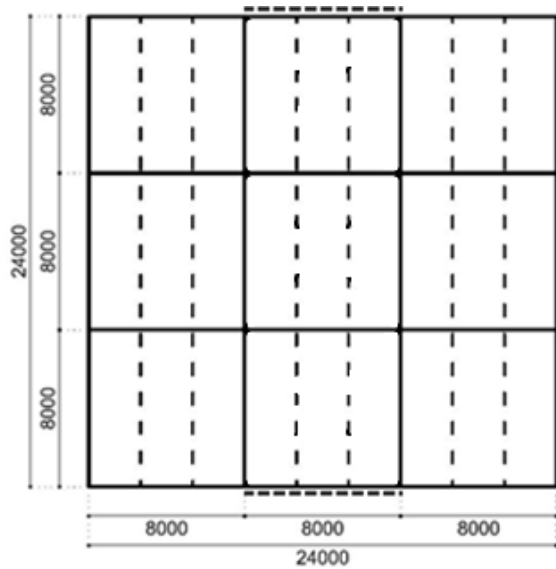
Plan of the 2/4/8-story archetype structures
